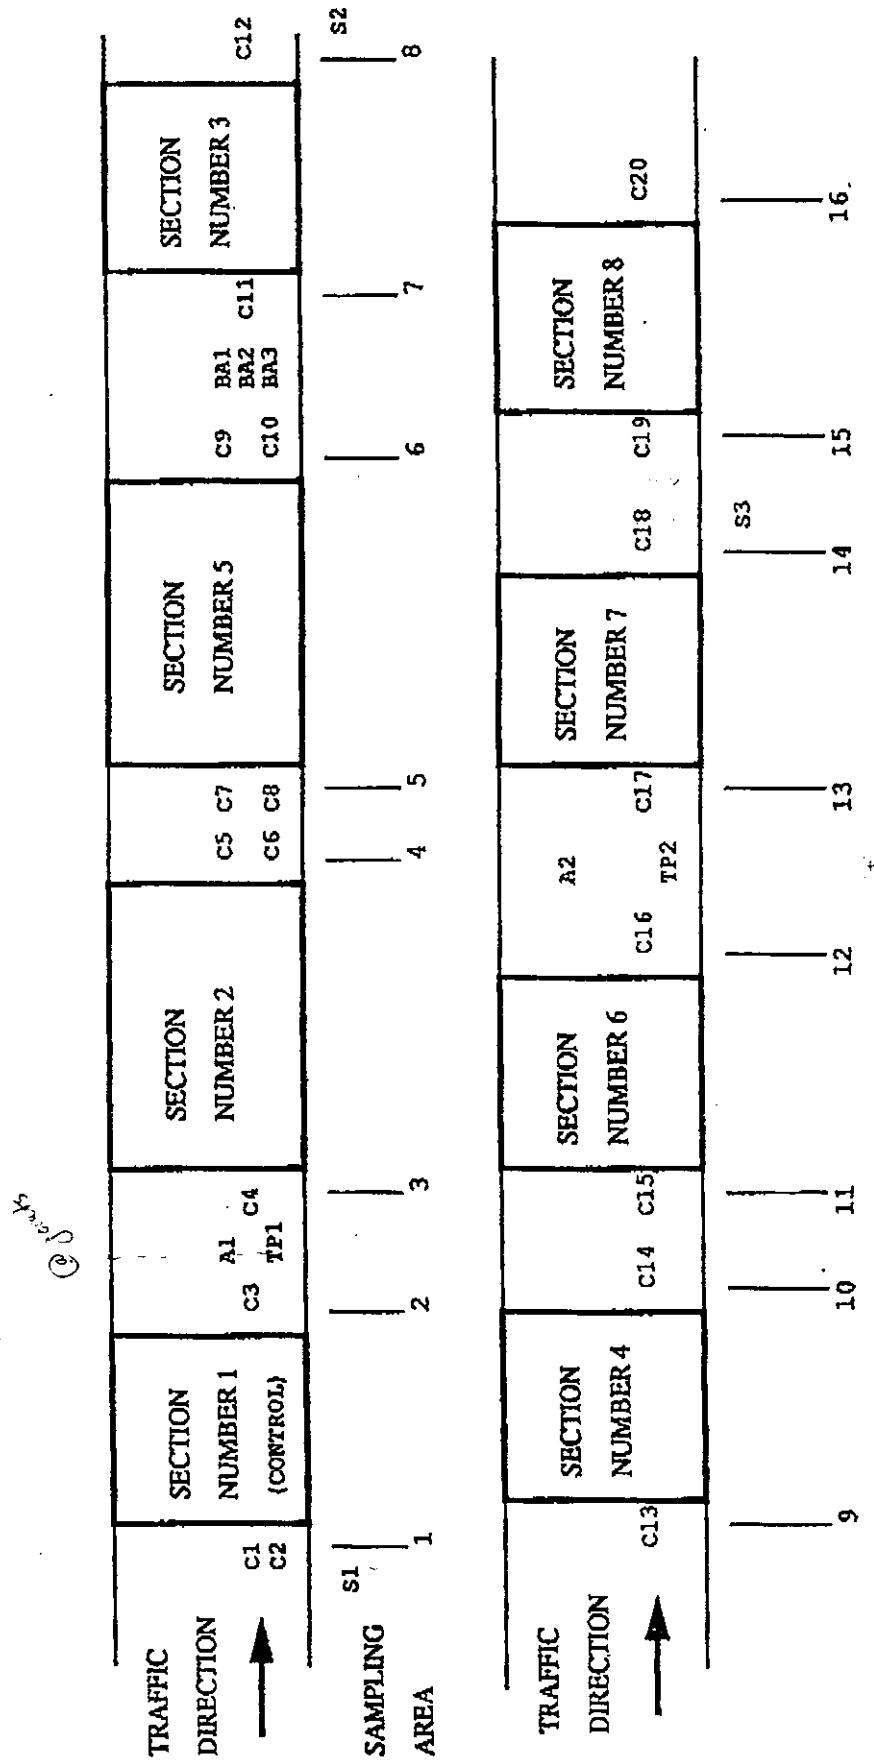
SPS-6 SITE LAYOUT AND SAMPLING LOCATION (POST-CONSTRUCTION)
